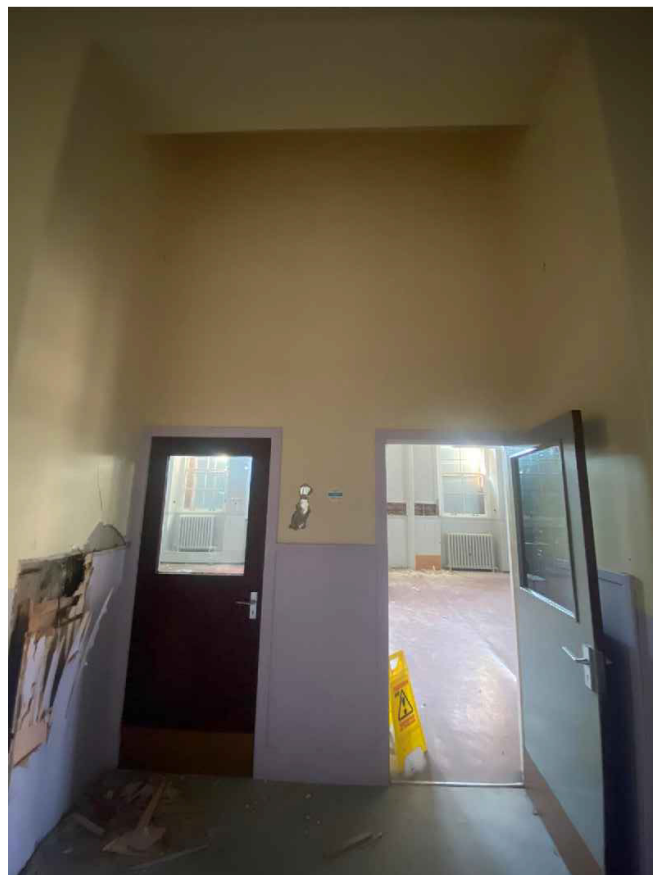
Detailed view of central replacement door openings leading into Room 0/2, looking south-east (© Trail Architects 2024)
